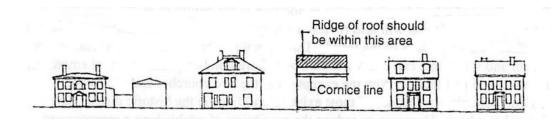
An example of acceptable building heights & cornice alignments for new construction in historic districts.
